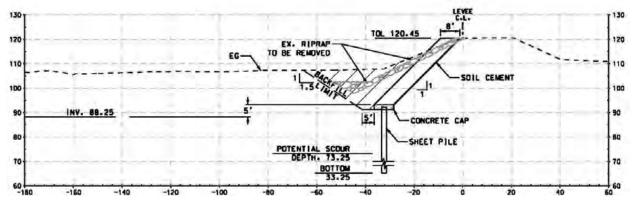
Typical Cross Section of Alternative A4 (Sta. 368+00)
